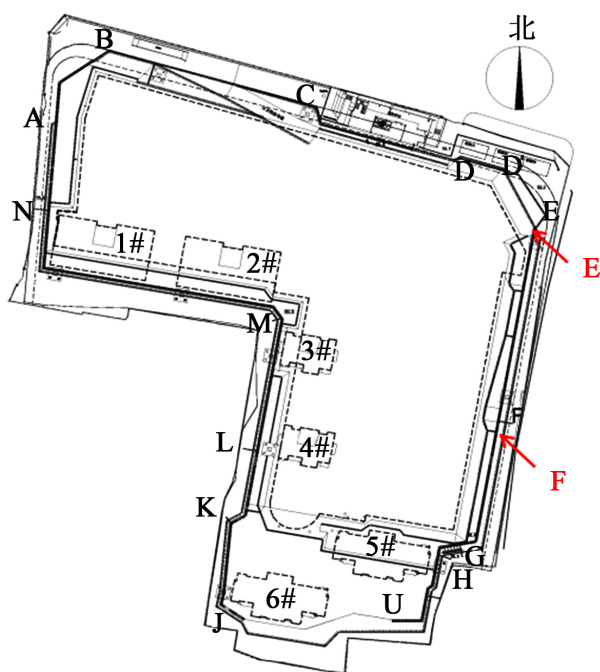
Foundation pit support Floor plan (Unreinforced scheme)
